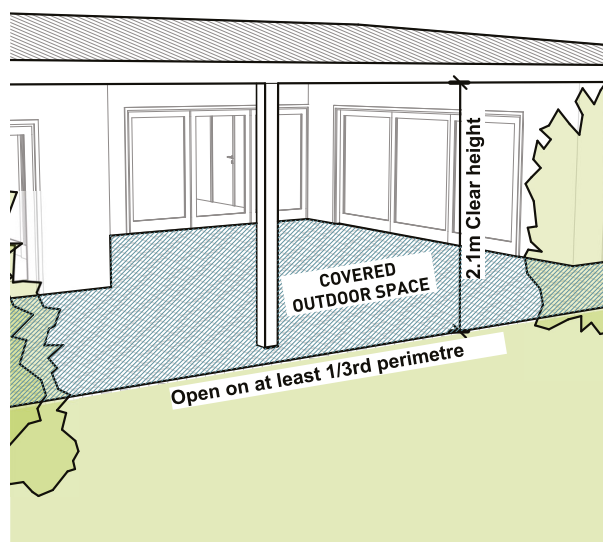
Covered areas such as verandahs can be included in outdoor space calculations.
